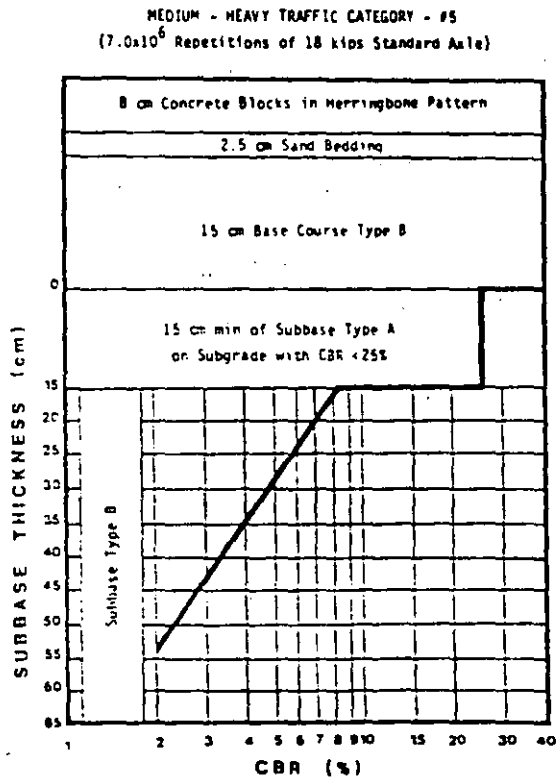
Design chart for concrete block pavements for medium-heavy traffic category (#5)
